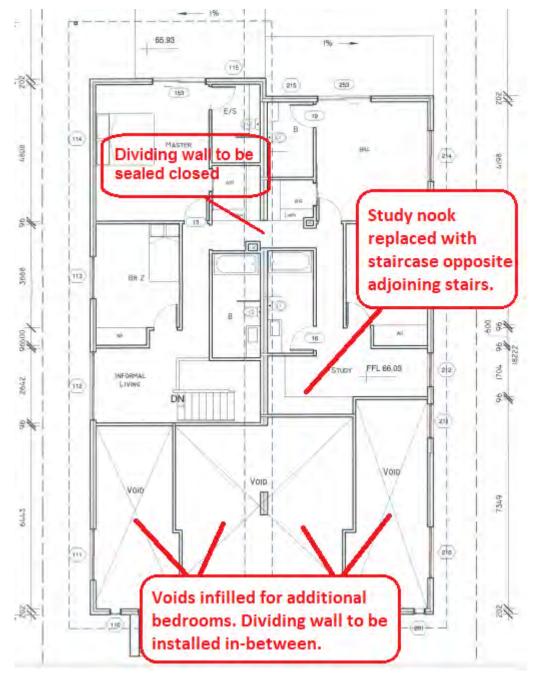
Existing first floor plan of the recently constructed dwelling house with the relatively minor modifications highlighted that are necessary to facilitate the conversion of the building into a dual occupancy (attached) development.
